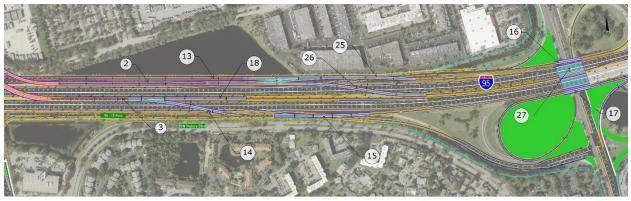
9: Proposed Bridge Location (2 of 3)
